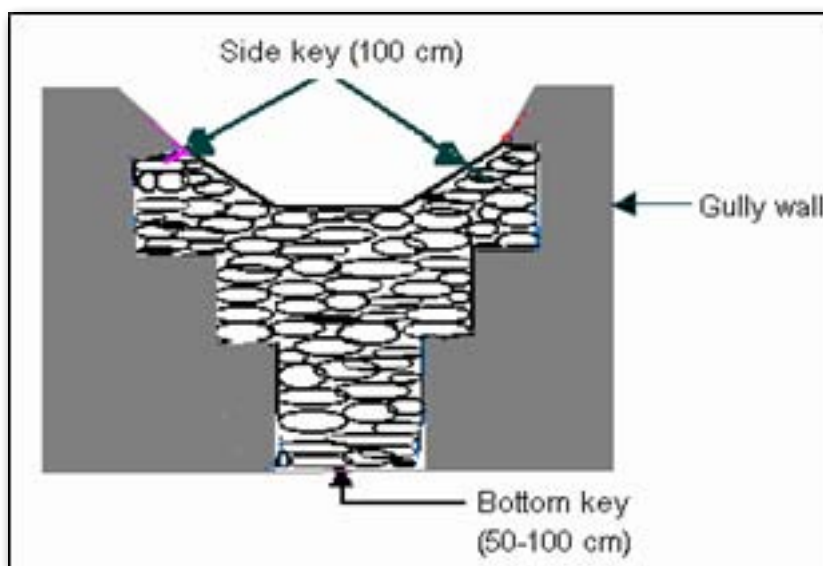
Check dam keyed into bed & its walls (abutments)
